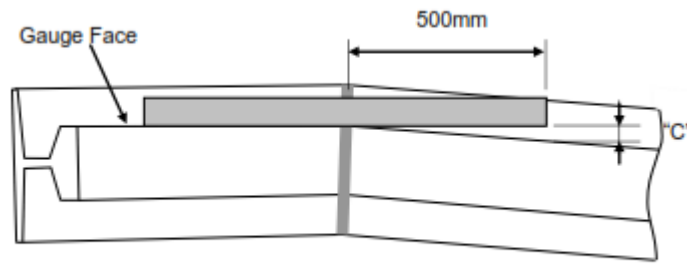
Weld misalignment tolerance in horizontal plane (tightening)
